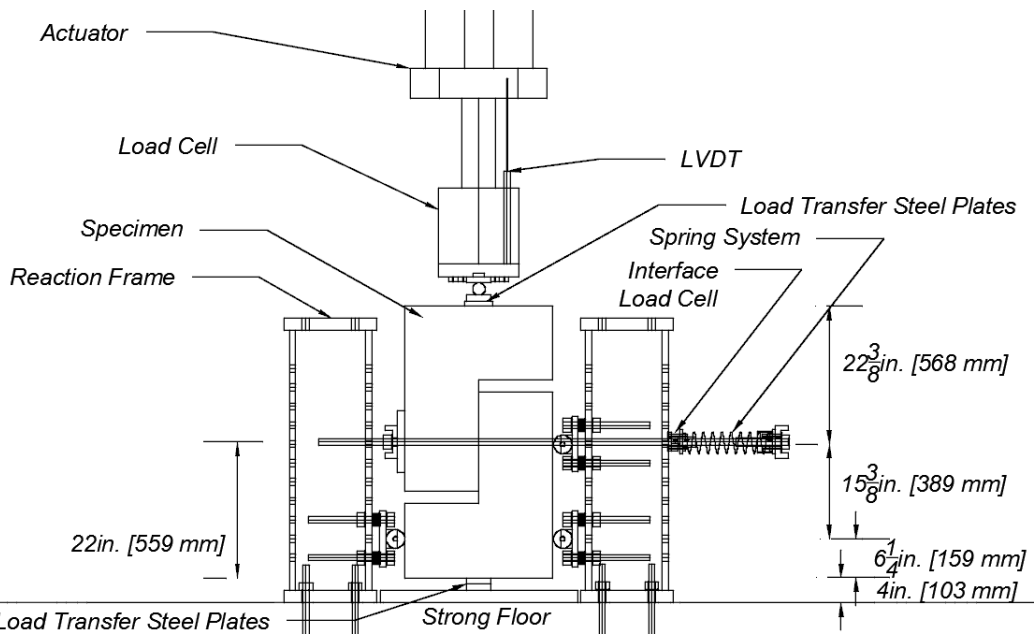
Side view elevation of test setup for the specimens containing #4 (#13M) reinforcing bars across the interface
